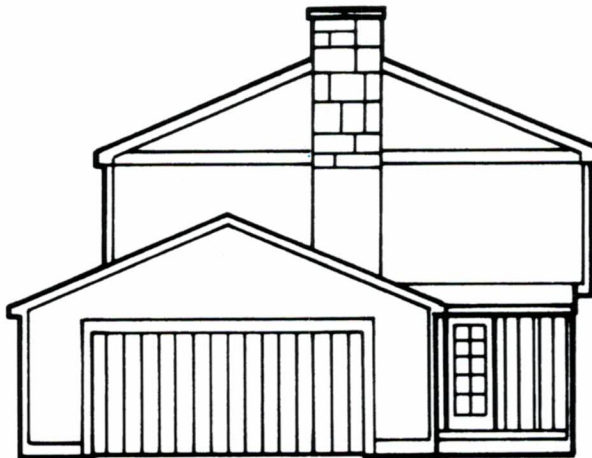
shows a building with a chimney and overhanging eaves to cover, together with some additional space near the front door that could possibly add 3,000 to 5,000 cubic feet to a structure that in itself, might measure as little as 12,000 to 15,000 cubic feet. If this additional space is overlooked the measurements could be off by as much as 25% to 35%.
